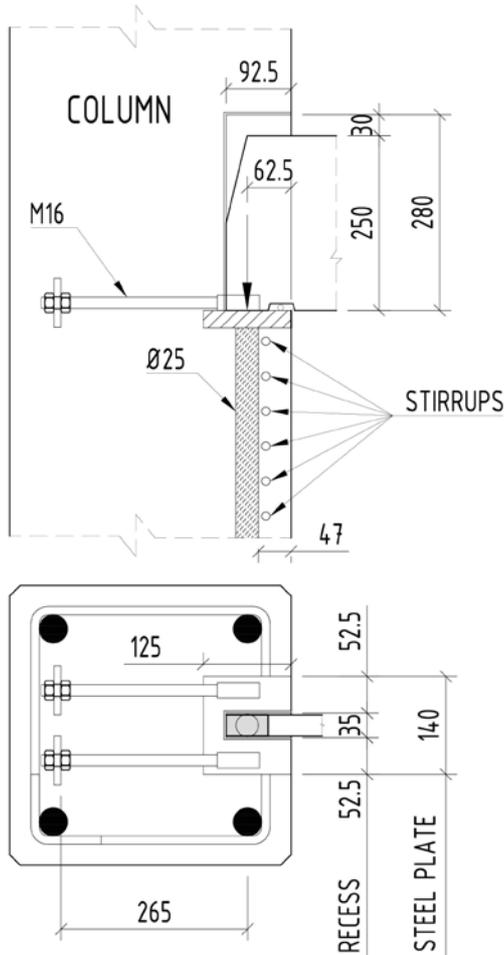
BSF450 column unit. (Centre stirrups are not illustrated.)
